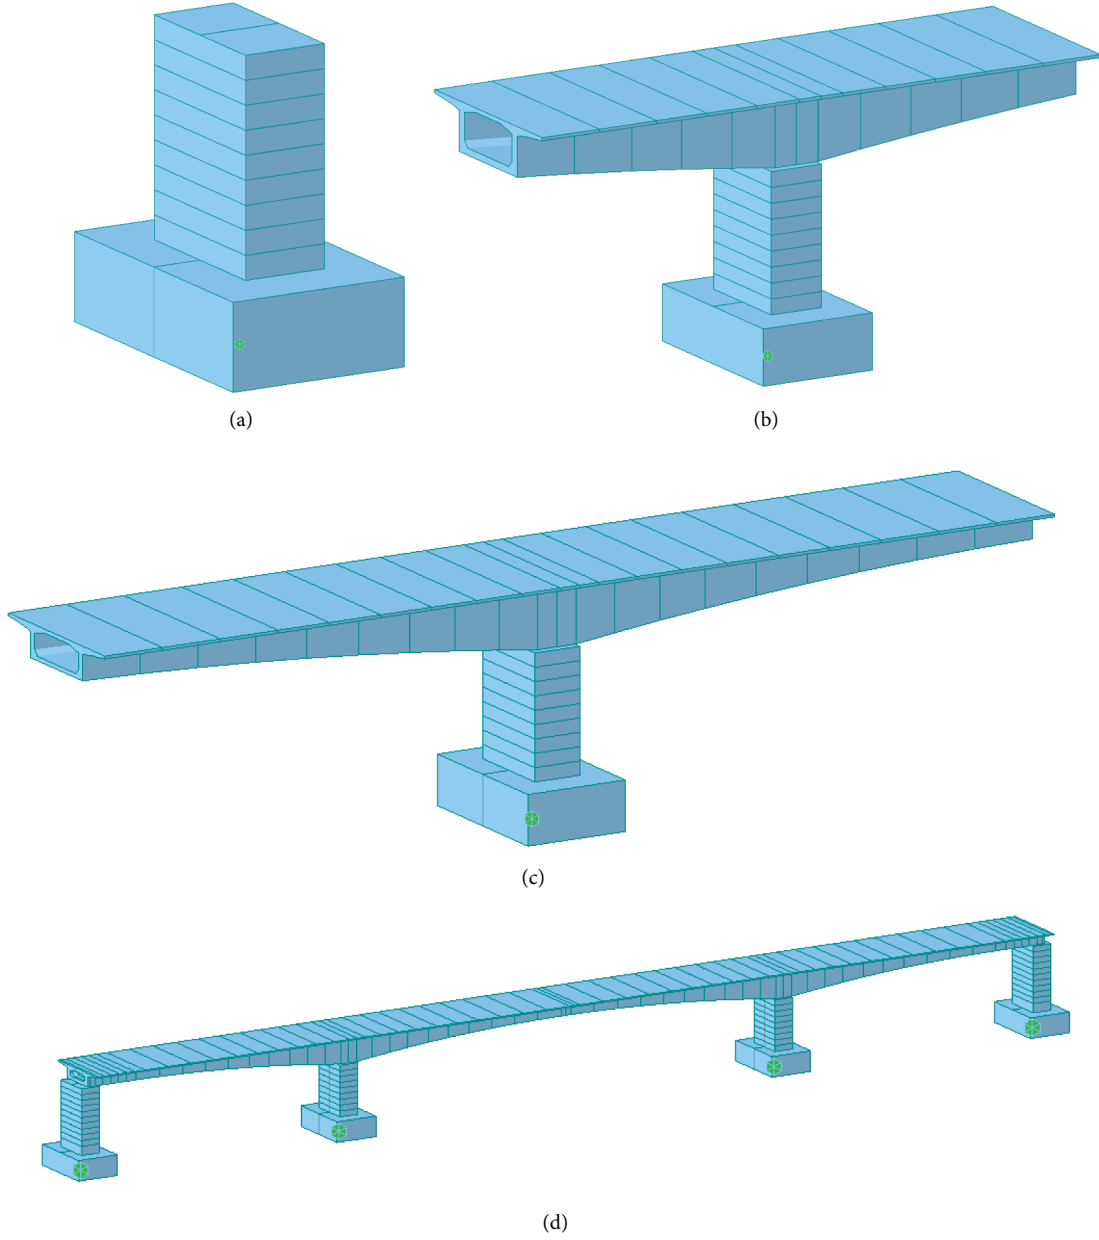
Researched construction stages for the case study bridge. (a) Substructure construction stage. (b) Middle cantilever construction stage. (c) Long cantilever construction stage. (d) Middle span closure construction stage and bridge completion construction stage.
